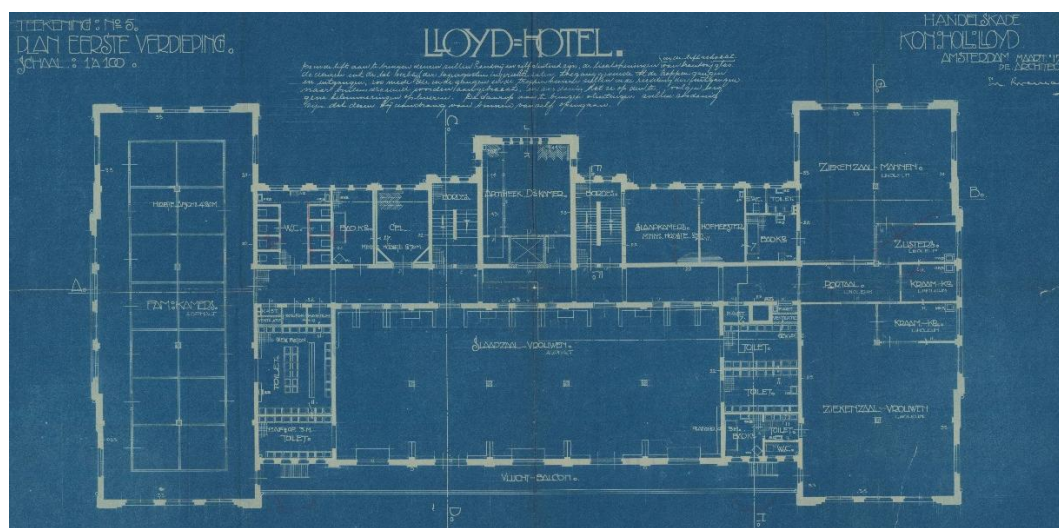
Floorplan first floor Lloyd Hotel ((Gemeente Amsterdam Archief; 24527; 10200288, 1917)
